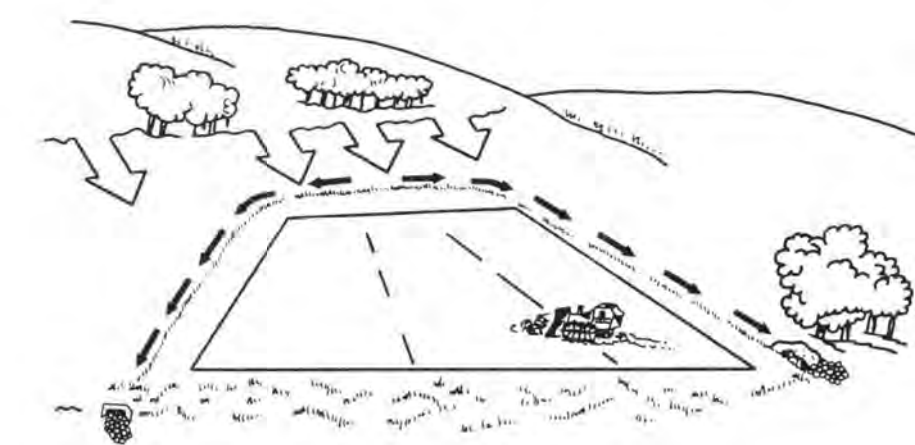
Perimeter dikes prevent surface runoff from entering construction sites.
